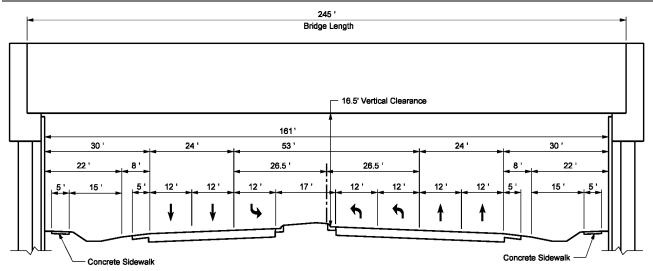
BUILD ALTERNATIVE NO. 1 PROPOSED TYPICAL SECTION – SR 33 UNDER I-4 LOOKING NORTH
